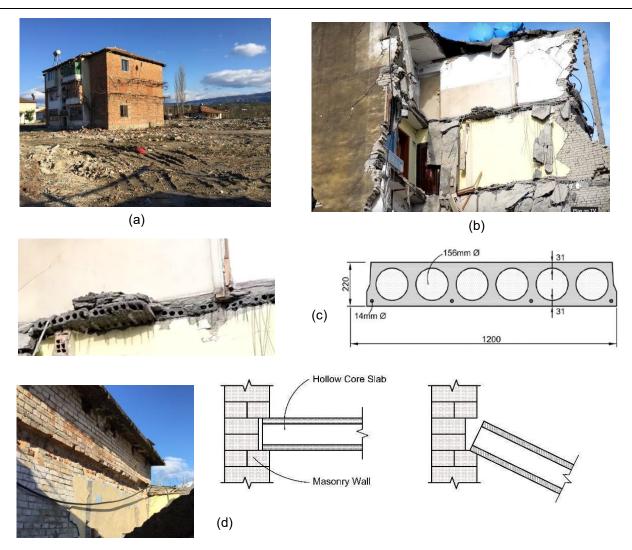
Collapse of mid-rise URM buildings in Thumanë: (a) an undamaged three-story URM building adjacent to the site of collapsed and demolished five-story building, (b) a partial collapse before the demolition (source: TV7 Albania (https://www.youtube.com/watch?v=2RXiG1KHC7k), (c) details of hollow core reinforced concrete slabs, and d) detail of floor-to-wall connection (source: SUZI-SAEE).
